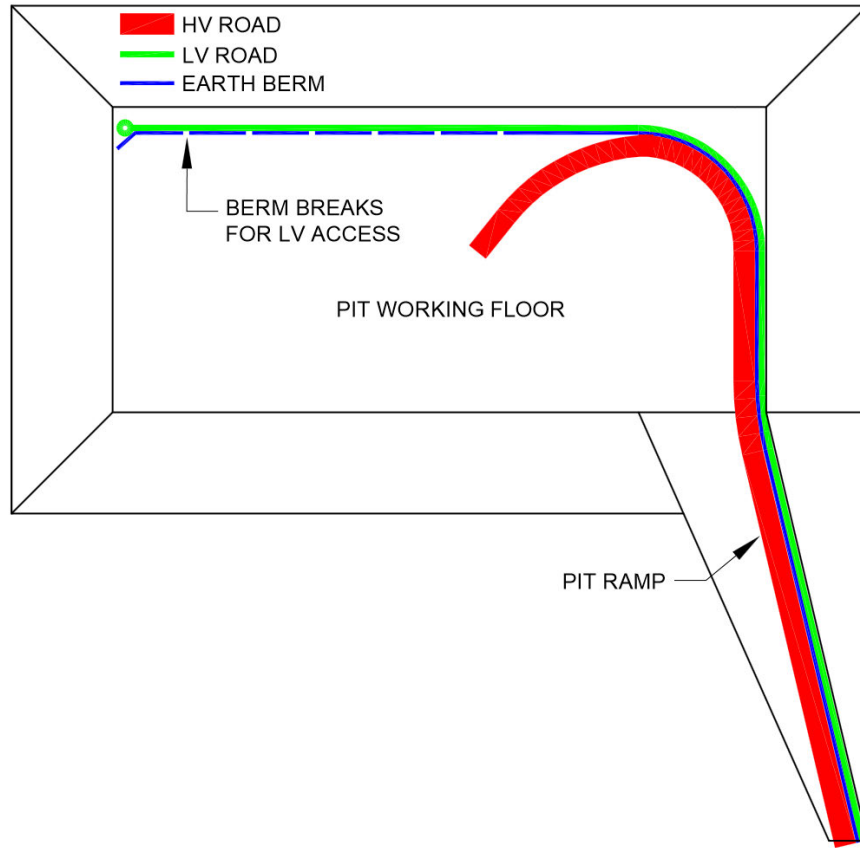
Plan view - Separation of HV and LV - Pit floor and Ramp
